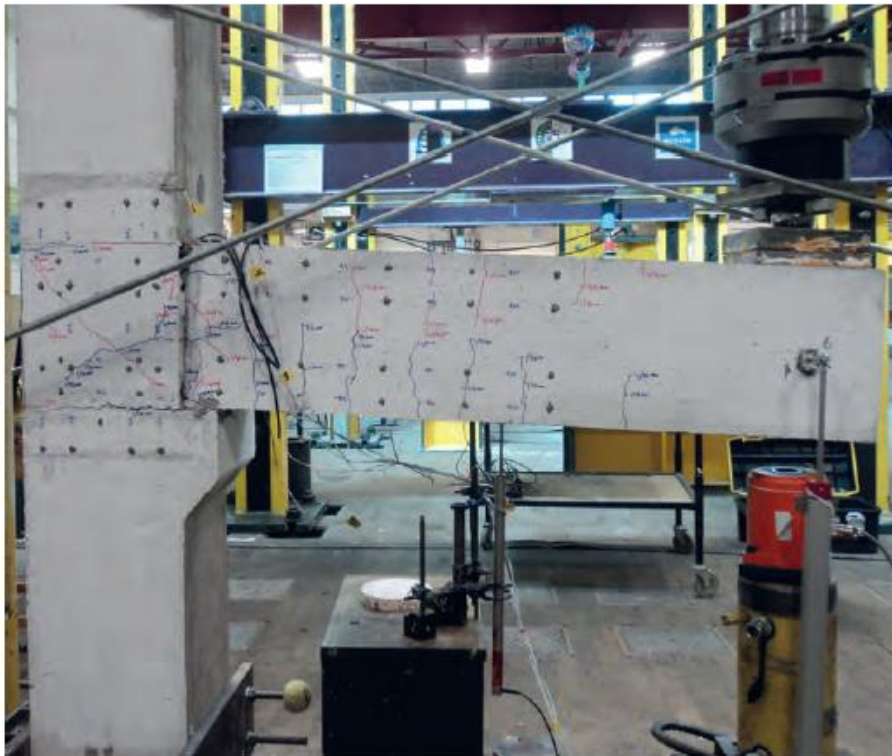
Crack pattern of beam-column specimen subjected to quasi-static loading (Specimen P2)
